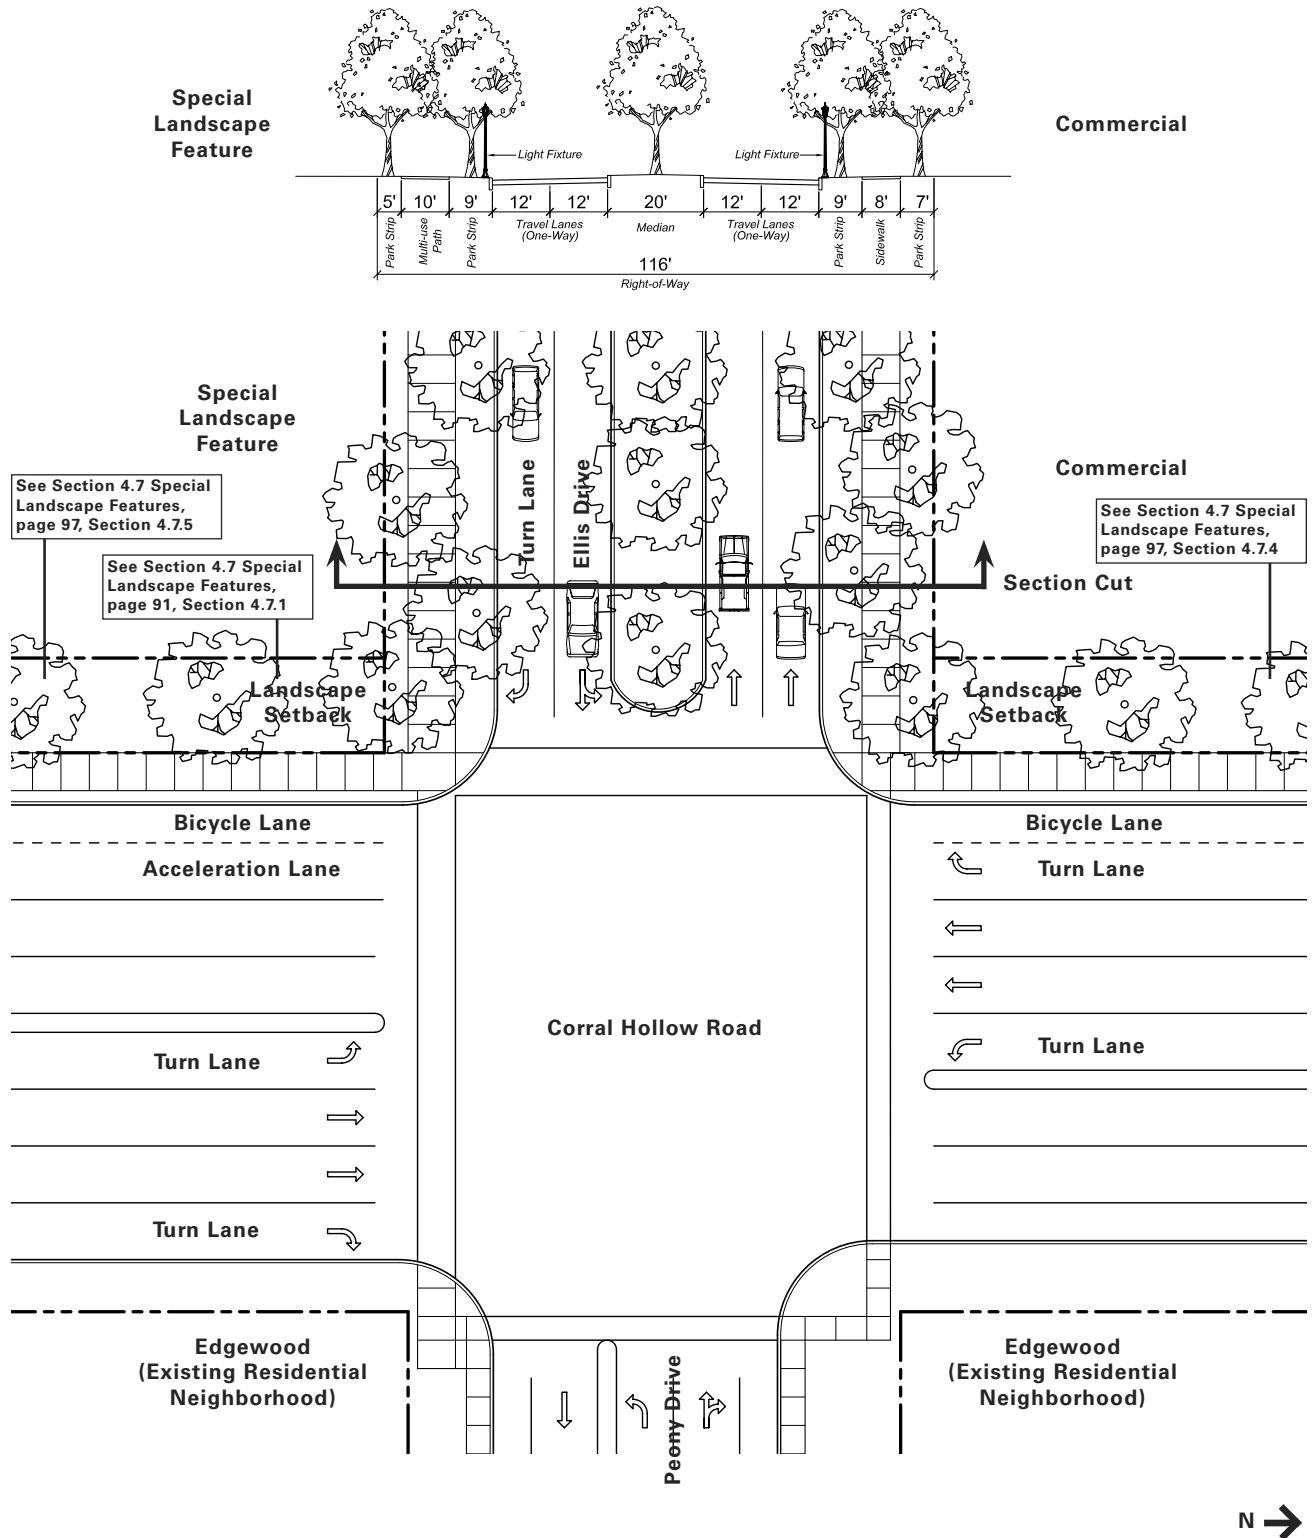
Proposed Section and Plan: Entry Street C (Ellis Drive)
